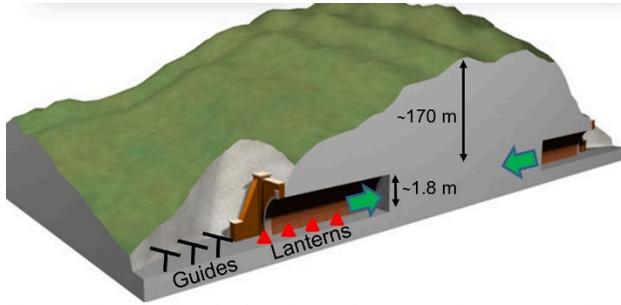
Idealized drawing of a tunnel cross-section depicting the use of guides outside the tunnel alignment and the use of lanterns within the excavated portion.
